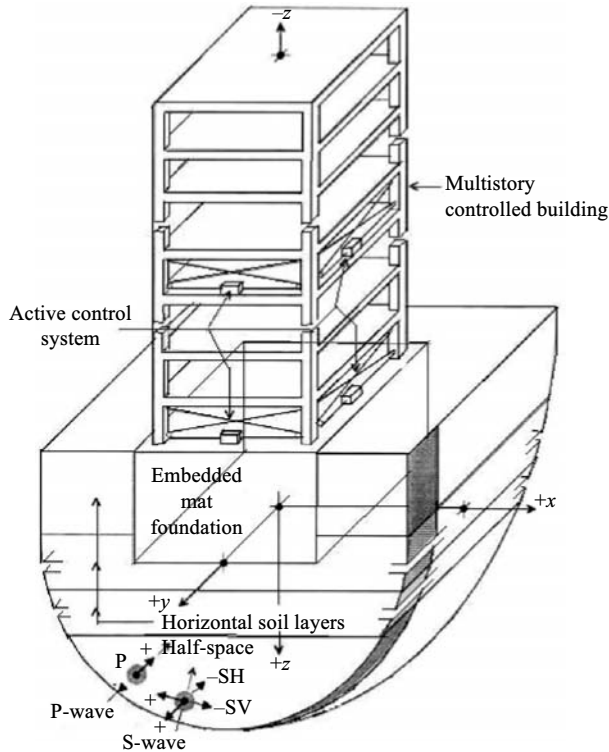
Multistory controlled building embedded in unbounded soil.
